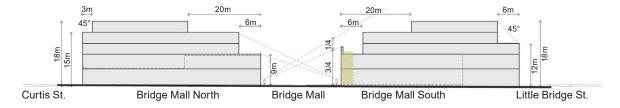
Built form test of street wall, setback and upper level heights- Section D
